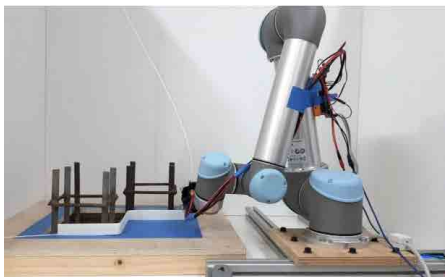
Perimeter printing proofs of a reinforced structural element. Source (Authors 2020).
